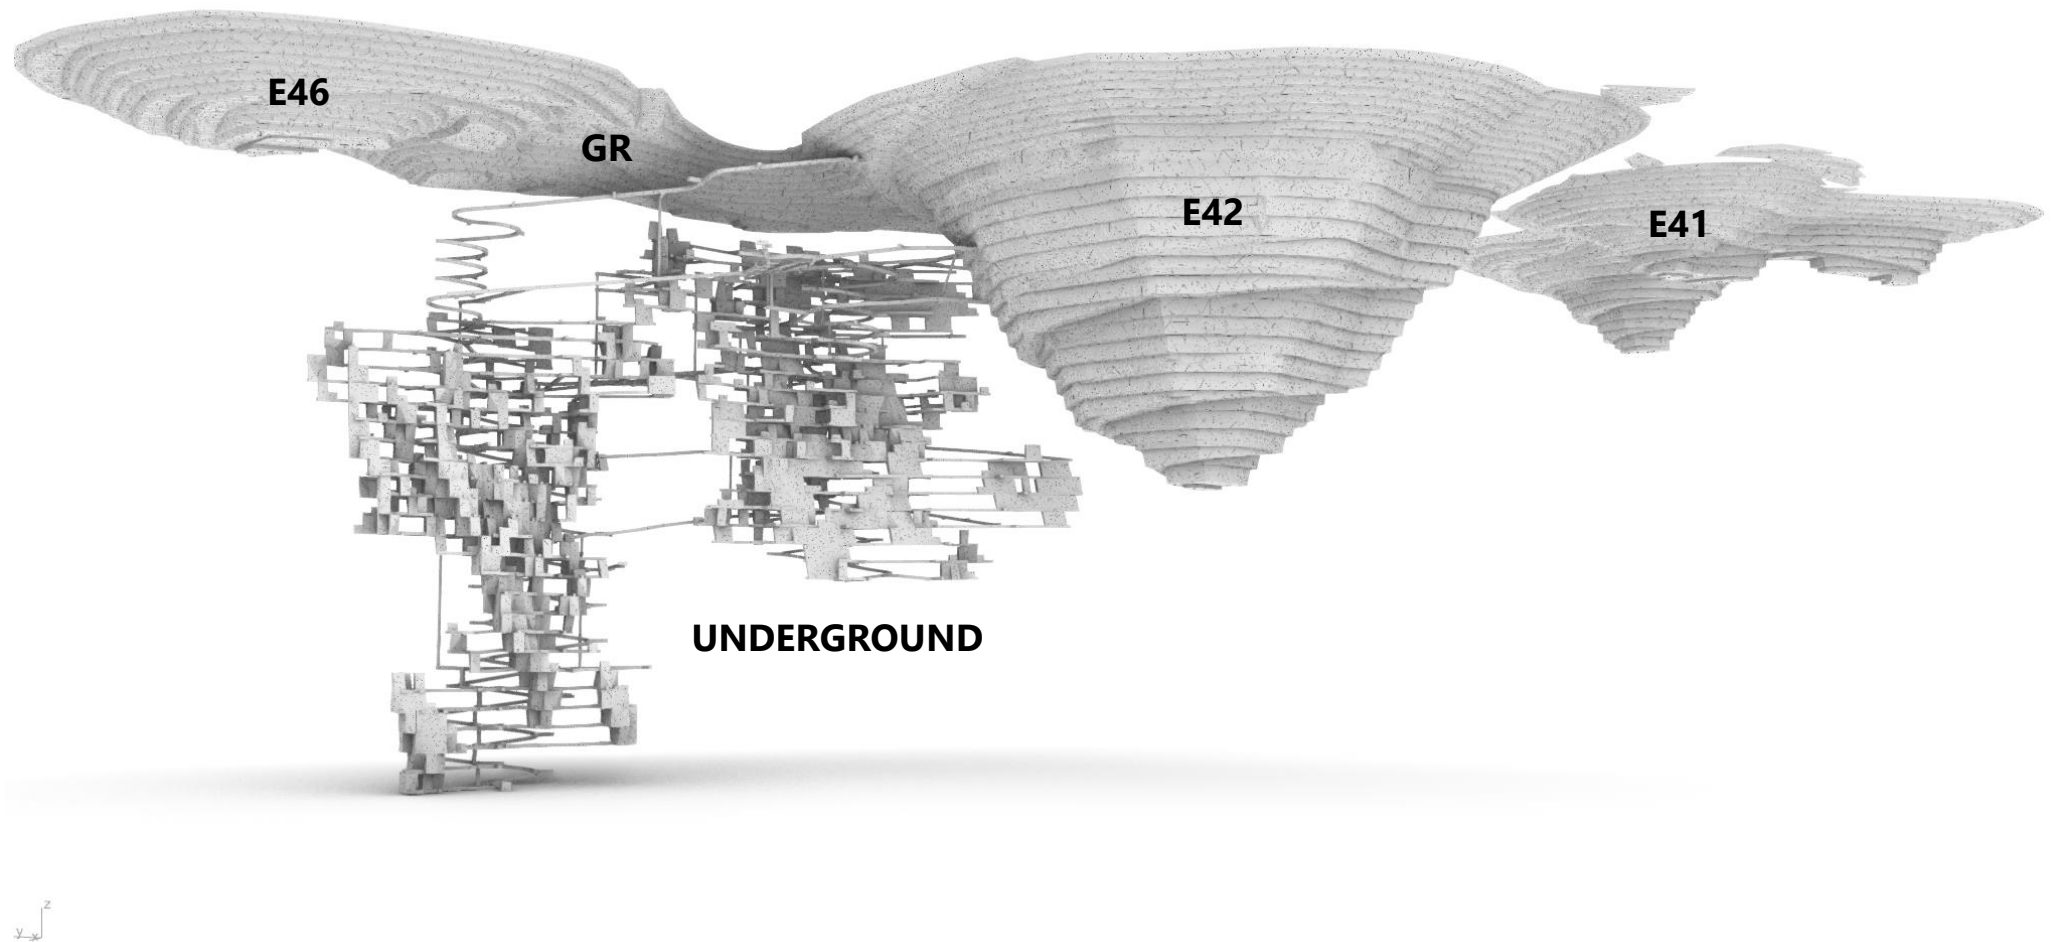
Open pit and underground mining excavation geometry included in the numerical model (view southeast, dumps & lake bund not shown).
